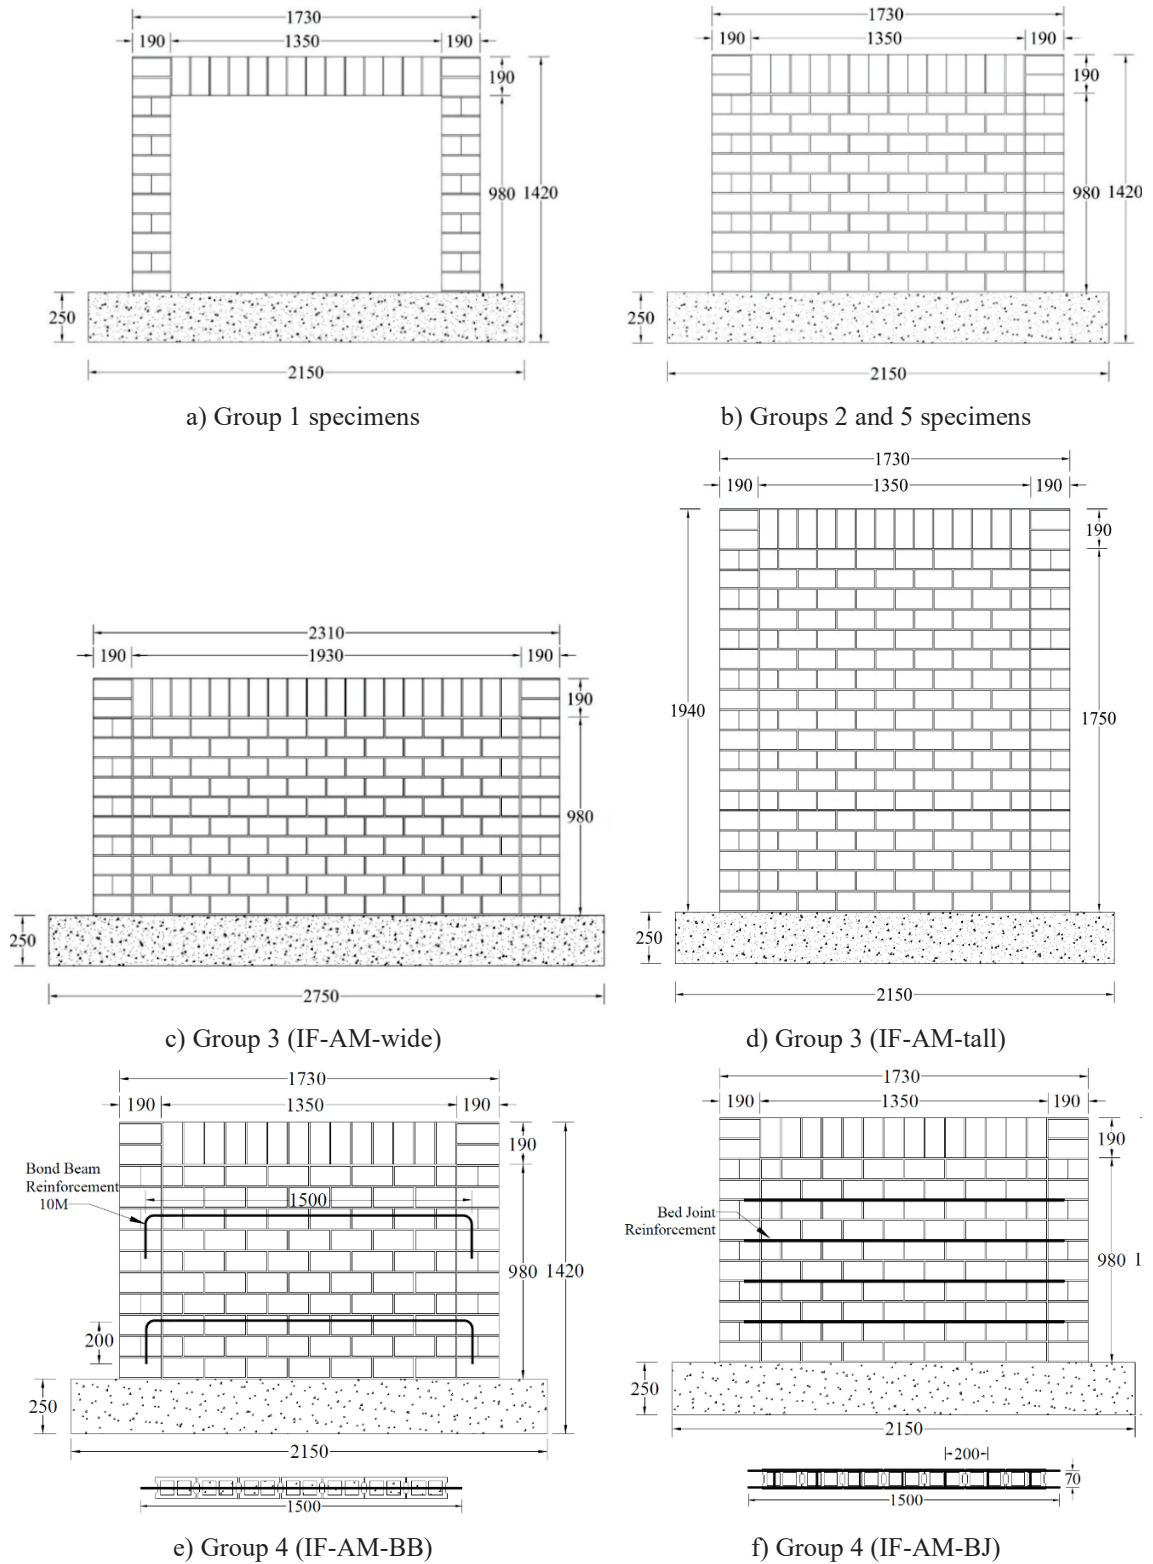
Geometric and design details of specimens (unit: mm) – cont'd
